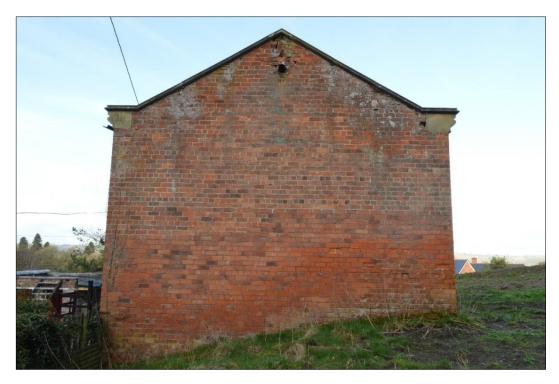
The east elevation of the Tank House. Photo CPAT 4602-0009
